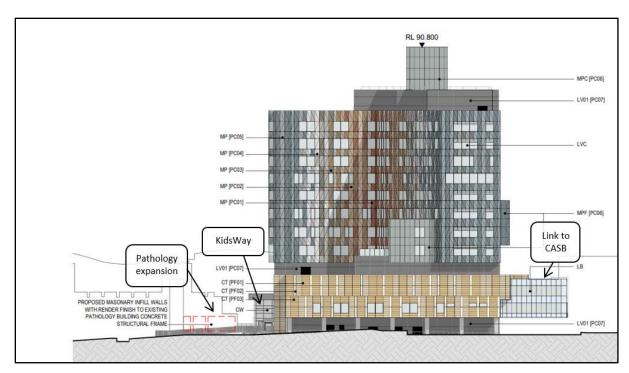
| PSB north-west elevation and materiality (Source: Applicant's RtS)
